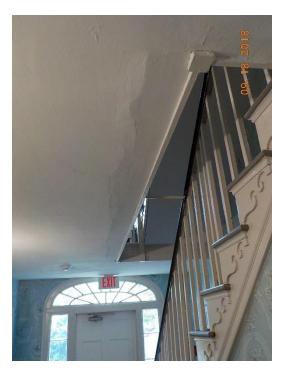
Plaster Distress at 2<sup>nd</sup> Floor Framing at Stairway Opening
